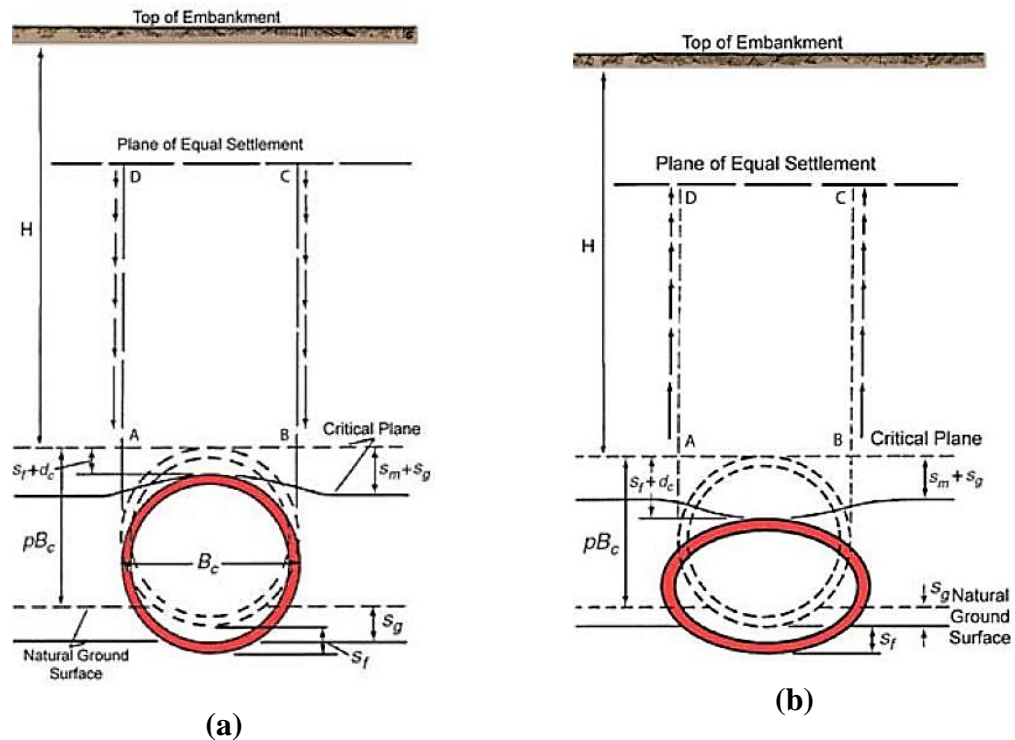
Behavior of (a) rigid pipe and (b) flexible pipe under embankment installation, (Moser, 1990)
